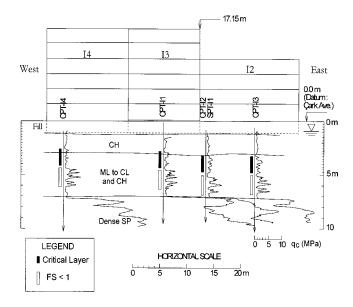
West to east generalized soil profile of Site I (cross section A-A' in Fig. 11)
